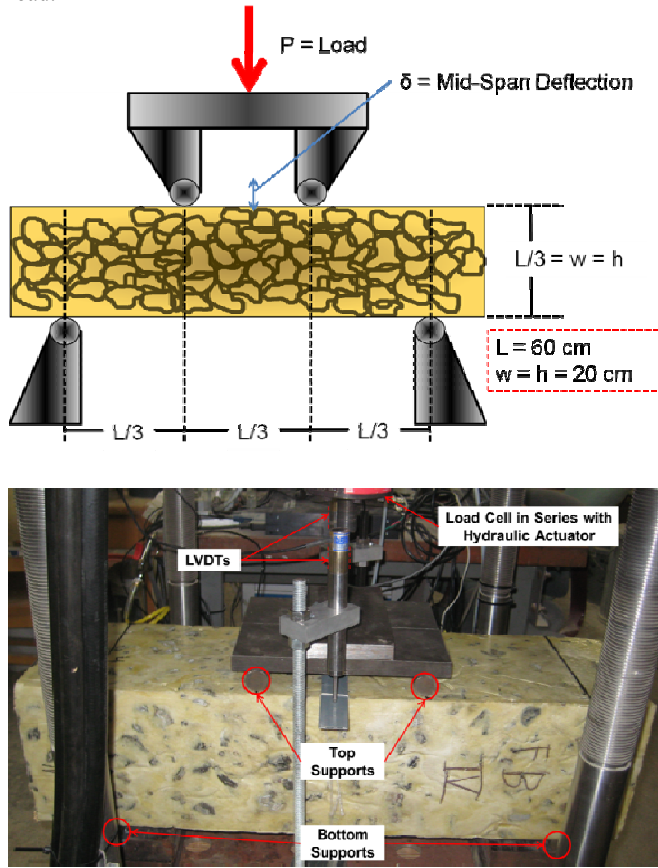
Typical “third-point” loading setup and chosen dimensions for PSB beams
